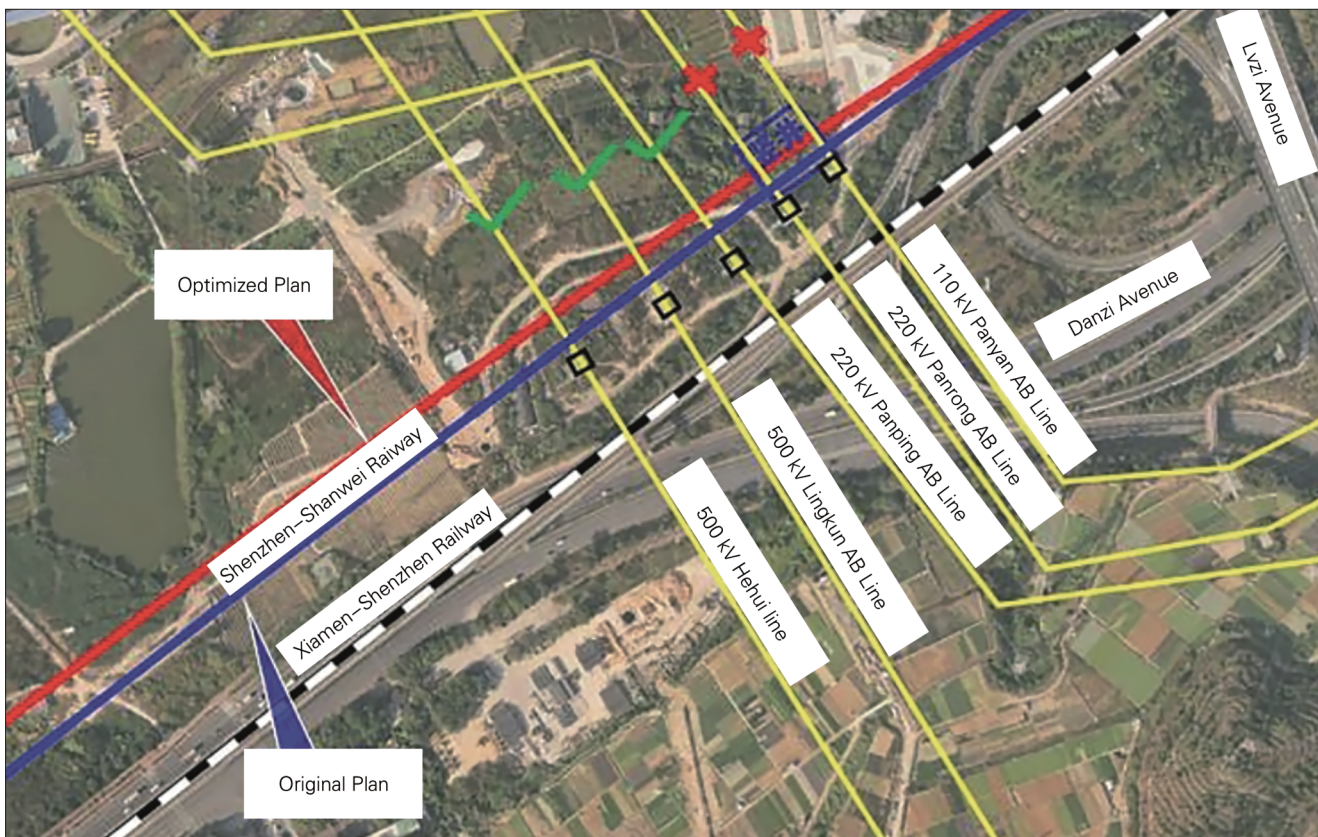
Plane Diagram of the Pingshandong Tunnel Exit of Shenzhen-Shanwei Railway and High Voltage Towers
